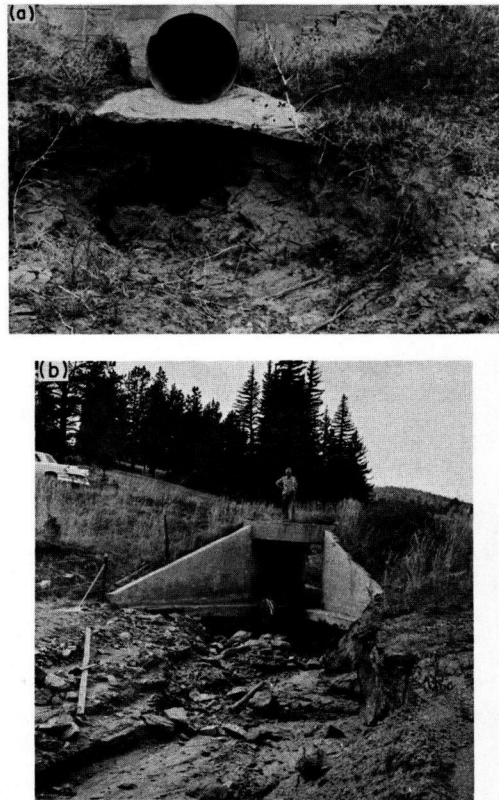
Erosion at culvert outlets caused by accelerated flow; (a) pipe culvert, and (b) box culvert.
